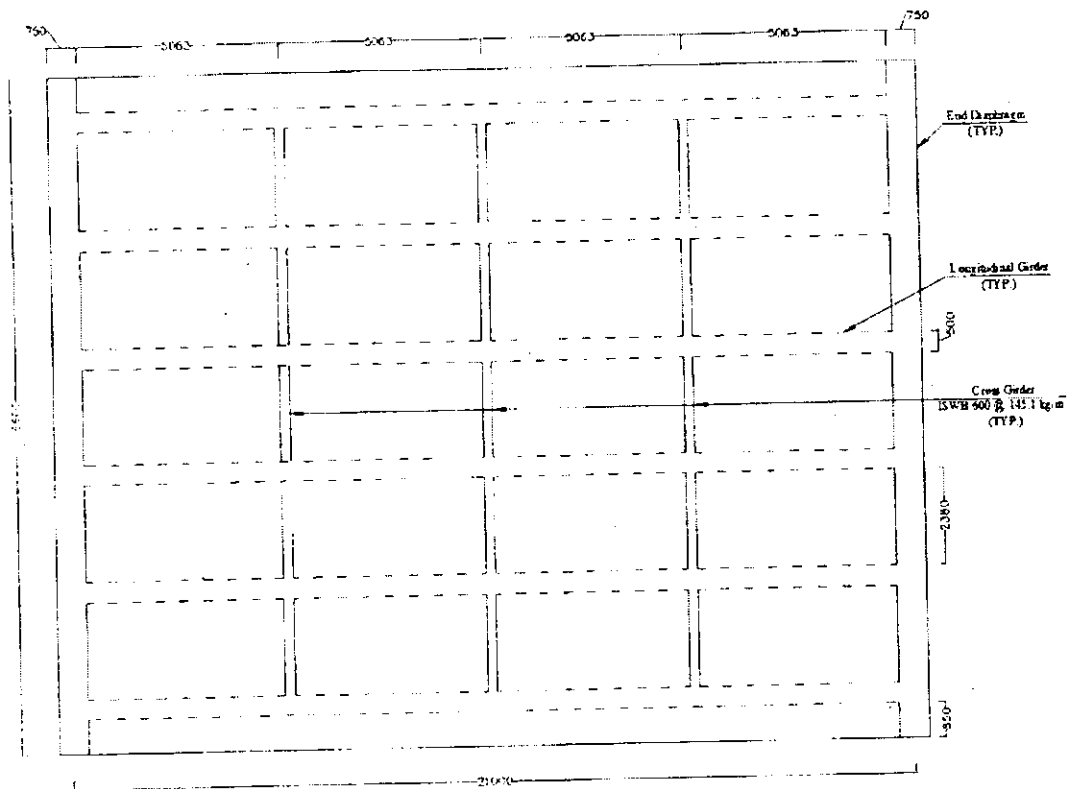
LAYOUT OF STEEL CROSS GIRDERS IN A SPAN
